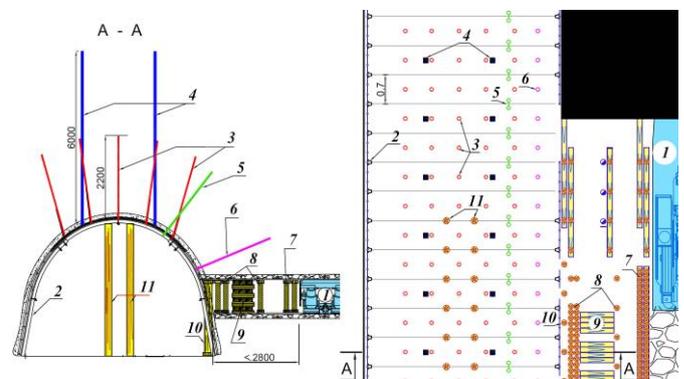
Support and reinforcement pattern of the gateroad #165 at intersection with #163 longwall: 1 – longwall set of equipment; 2 – steel arch support KShPU-17,7; 3 – rock bolts; 4 – cable bolts, length 6.0 m, paired installation, spacing 1.4 m; 5 – rock bolts connected to the top section of arch support; 6 – rock bolt for strengthening of the roof above the roadside pack; elements of roadside pack: 7 – breaker row; 8 – breaker props; 9 – chock; 10 – wooden prop between roof of the seam and floor of the gateroad; 11 – wooden props installed under each steel arch
